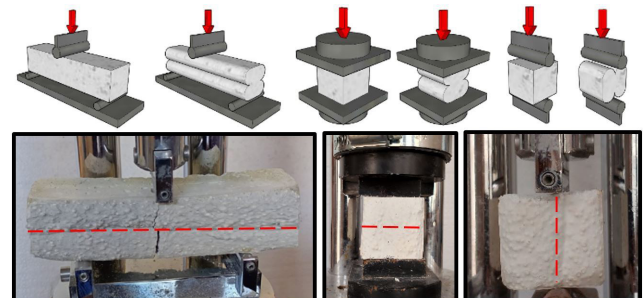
Mechanical tests of 3D printed epscrete specimens
